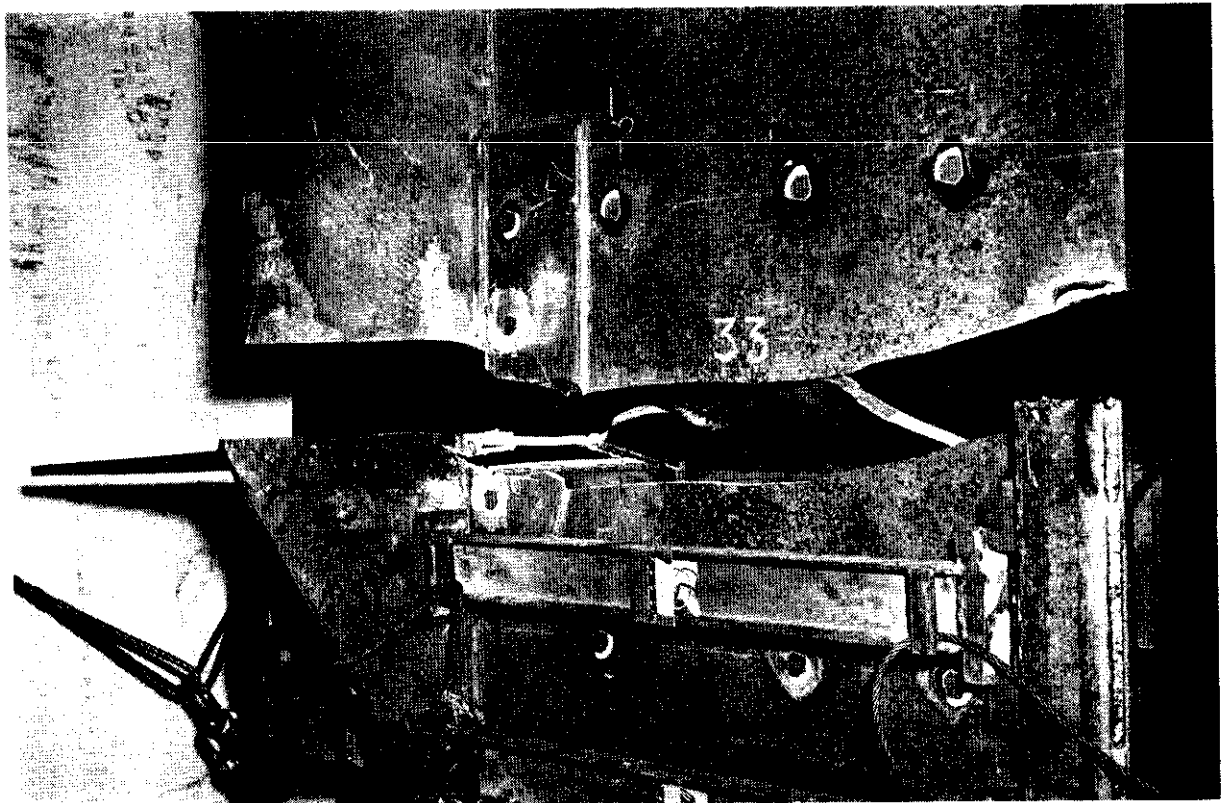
Specimen 33: View of fractures from above deck and outboard
